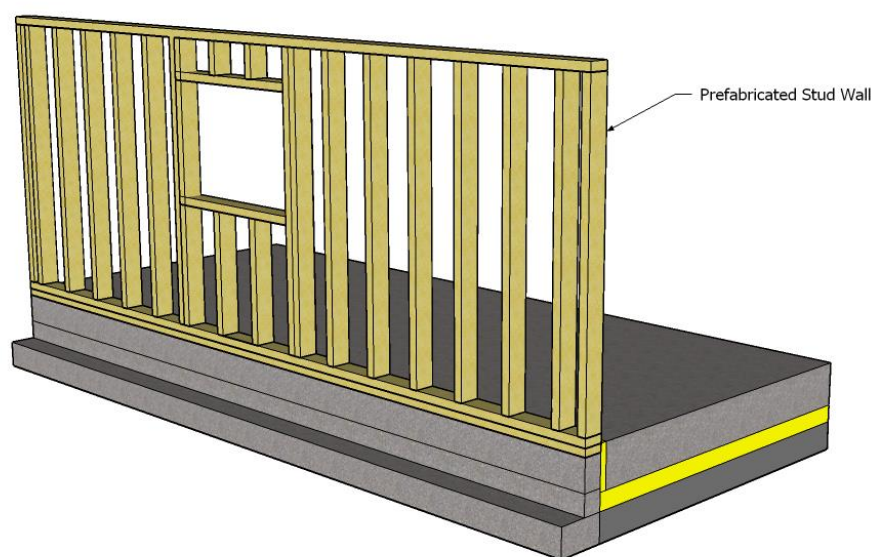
Typical Prefabricated timber frame wall positioned on top of soleplate
